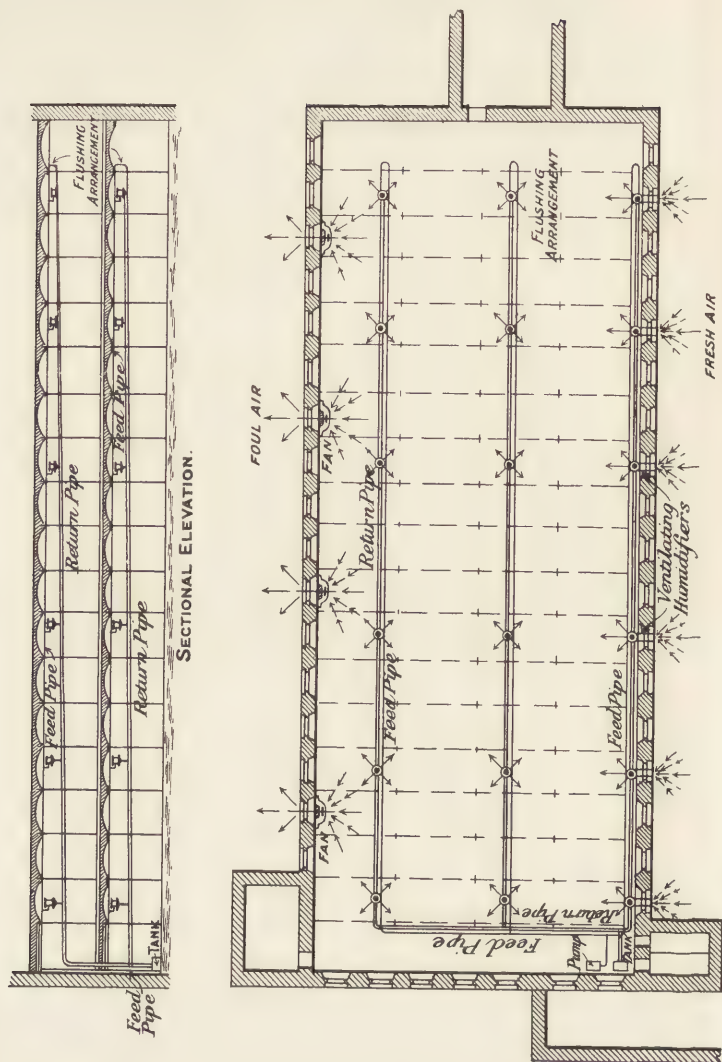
PLAN AND ELEVATION SHOWING HUMIDIFYING INSTALLATION.
